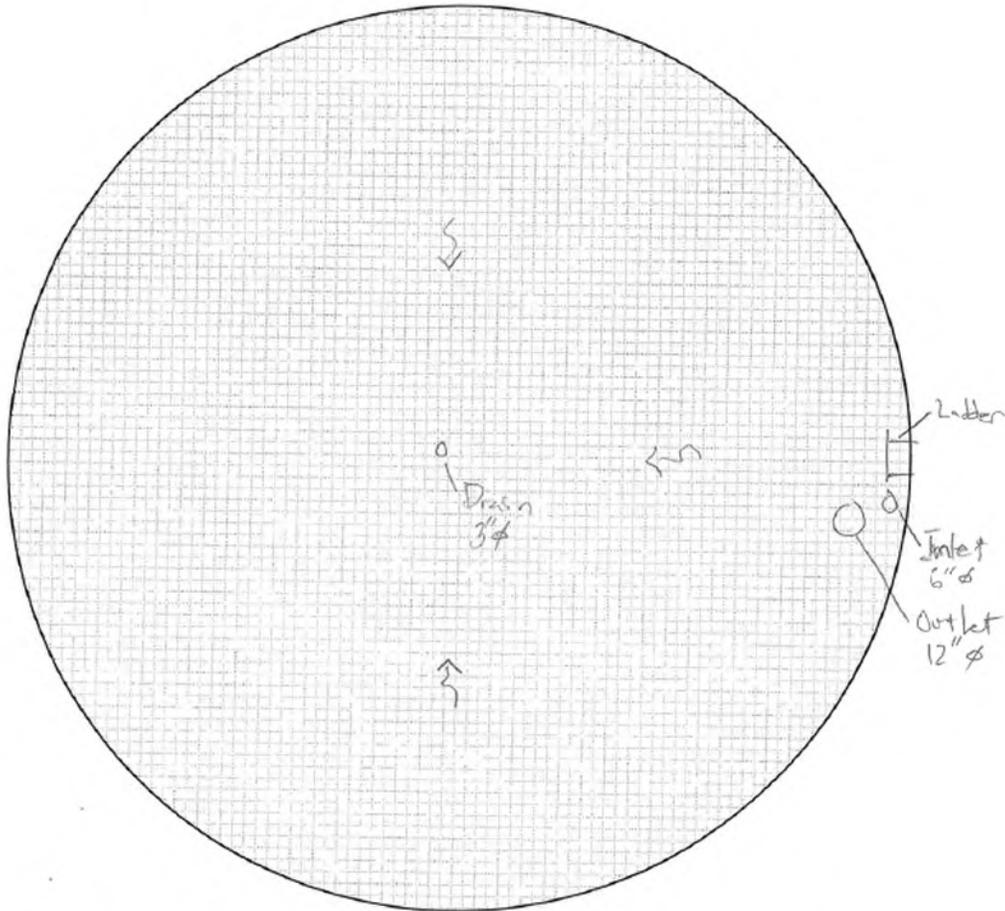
Reservoir INTERIOR FLOOR Plan – Note location of columns, inlet, outlets, etc. List given and measured diameter. (Note columns on next sheet)
